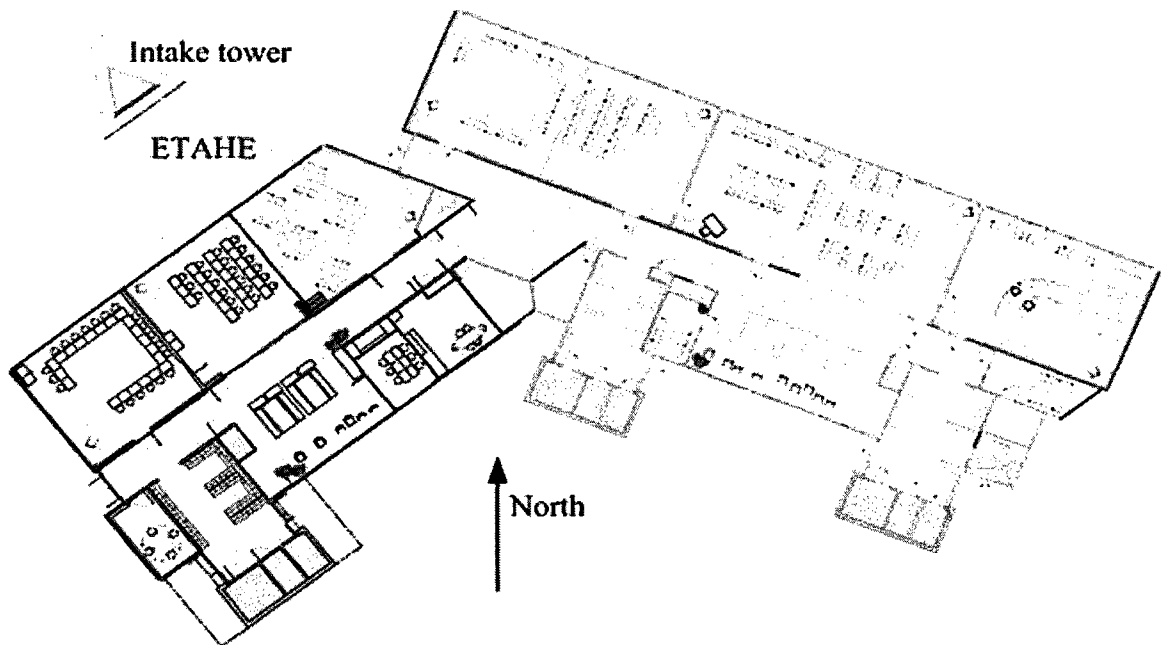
The Mediå School building layout (Tjelflaat 2002b)
